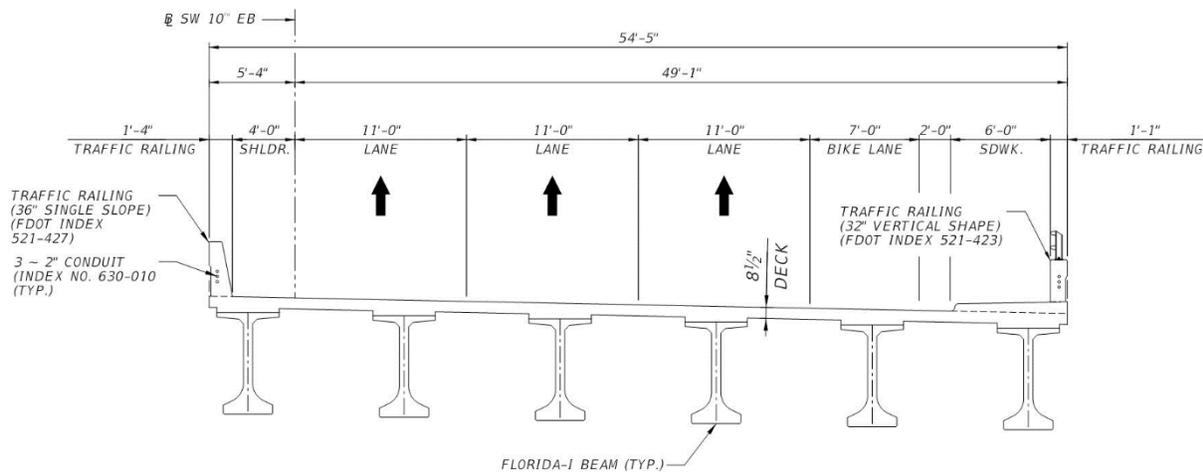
Bridge Typical Section (Bridge No. 8)
